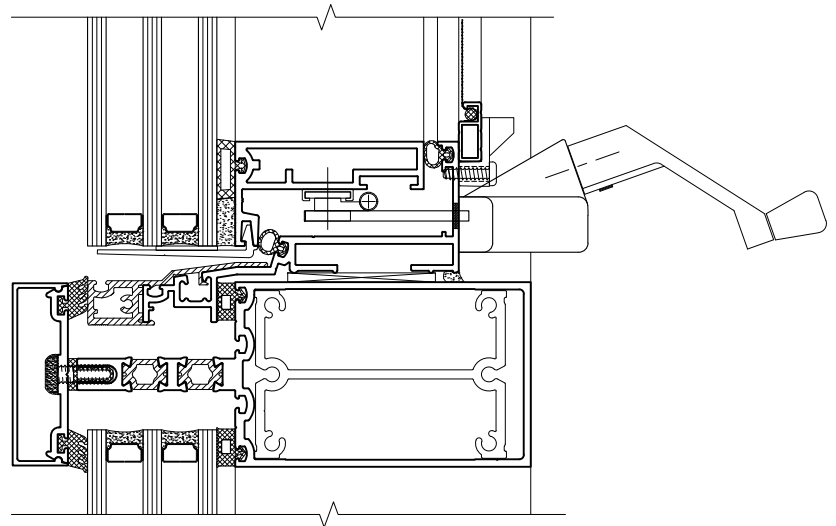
DETAILS SHOWING PROJECT OUT PHANTOM VENT WINDOW INSTALLED INTO THERMAWALL 2600
